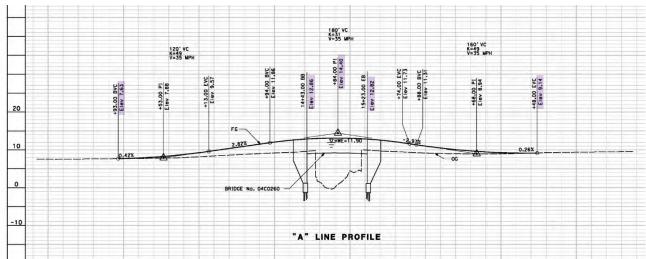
Proposed Bridge Profile Showing Elevations (NAVD88).
